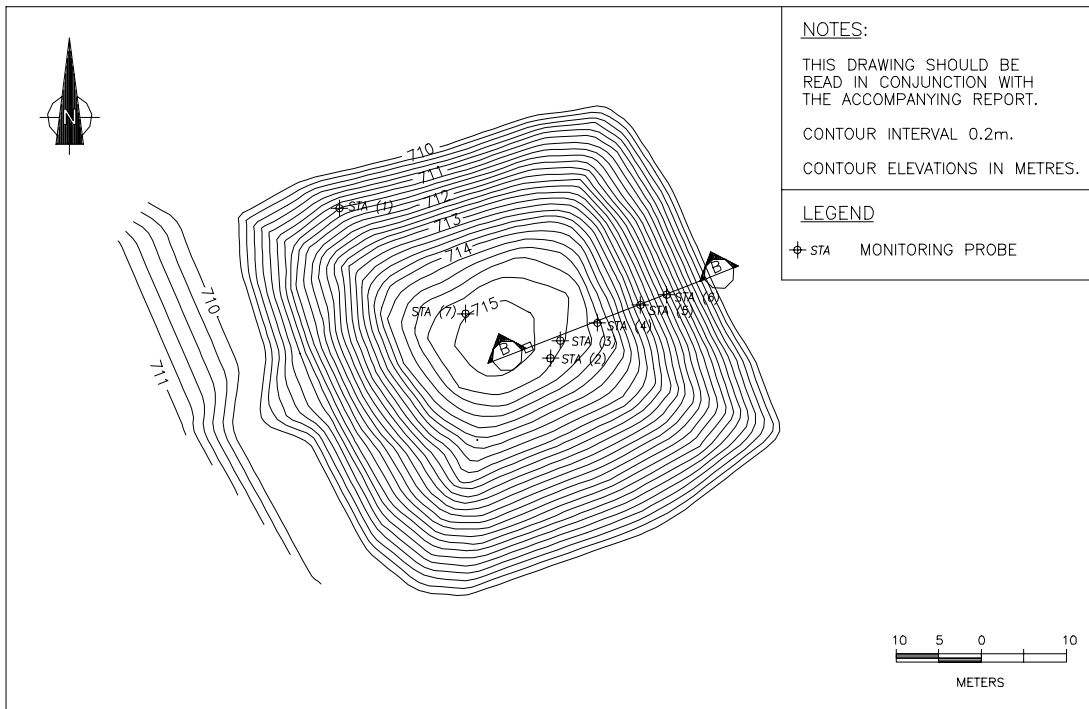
Site Plan, Waste Rock Pile 7/12
